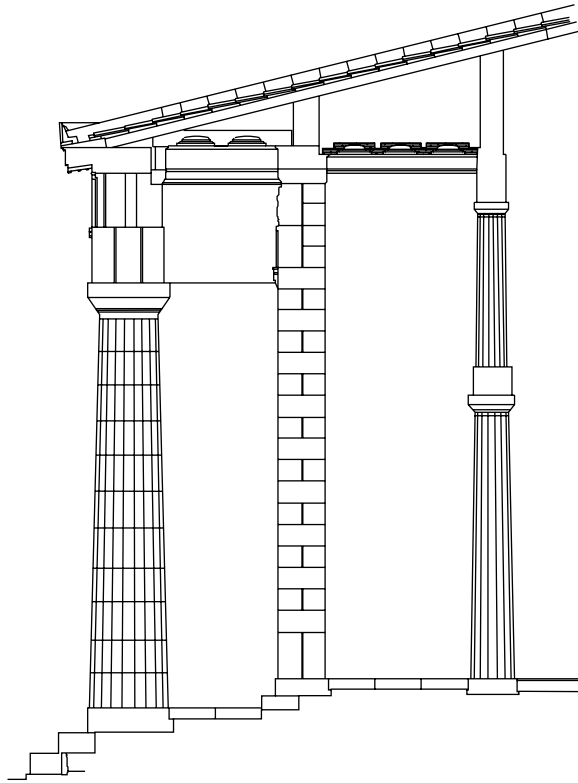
The Parthenon, section through interior, cella wall, and colonnade. *Source:* N. Klein.
